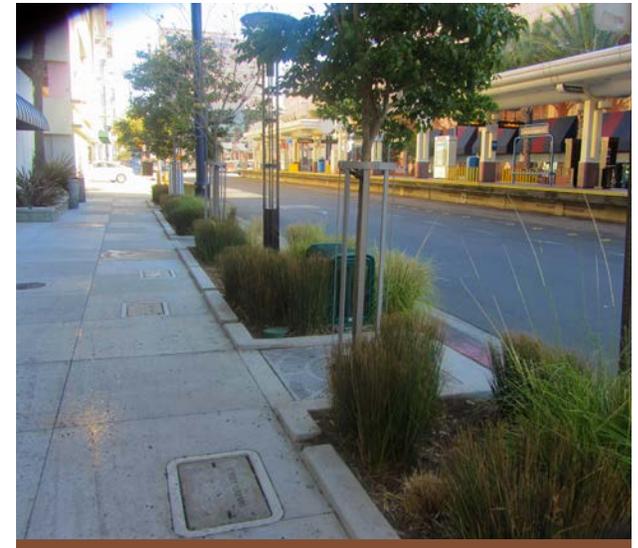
Tree trenches infiltrate sidewalk stormwater runoff at the intersection of 1st Street and Pacific Avenue .
